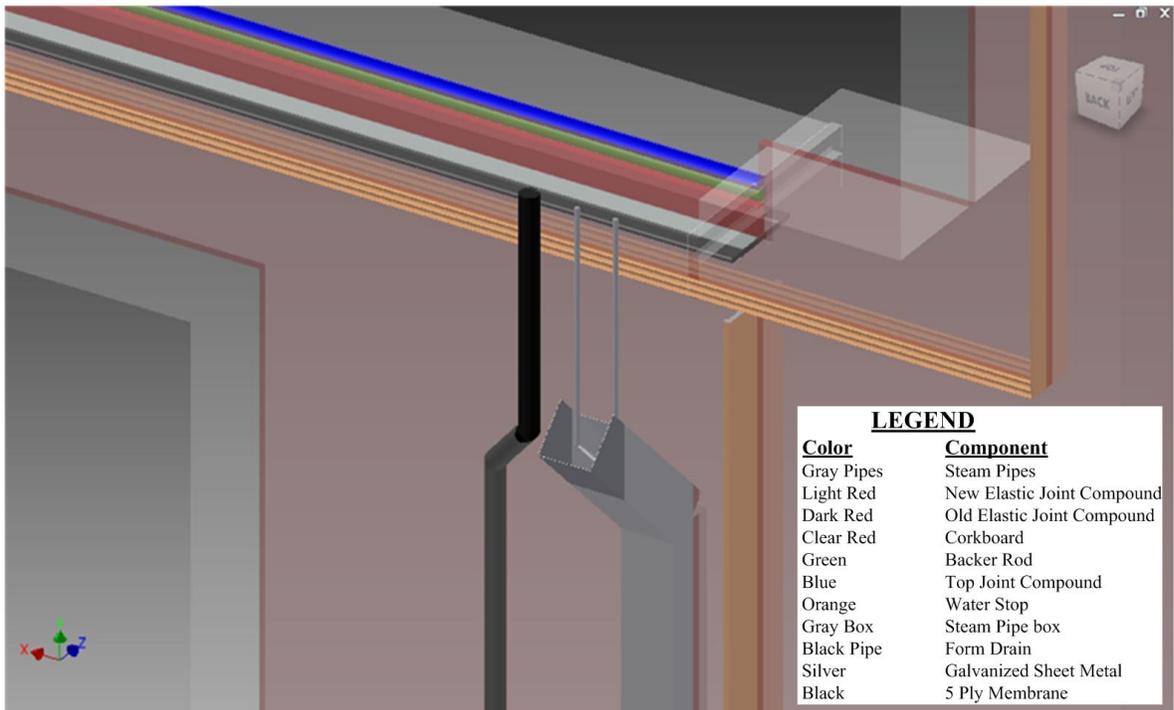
3-D diagram of a typical expansion joint at Folsom Dam Powerplant.
